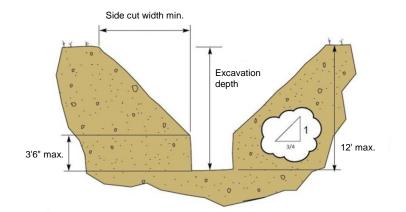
Sloped excavation with unsupported vertical lower walls
